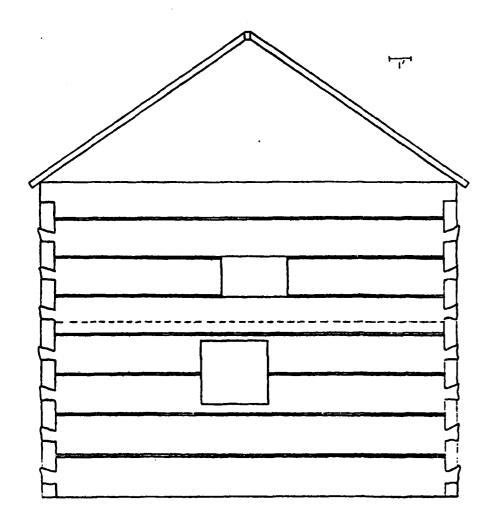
Jesse Johnson dwelling. Line drawing of left side of dwelling. Note second floor line and possible window opening in second story.
